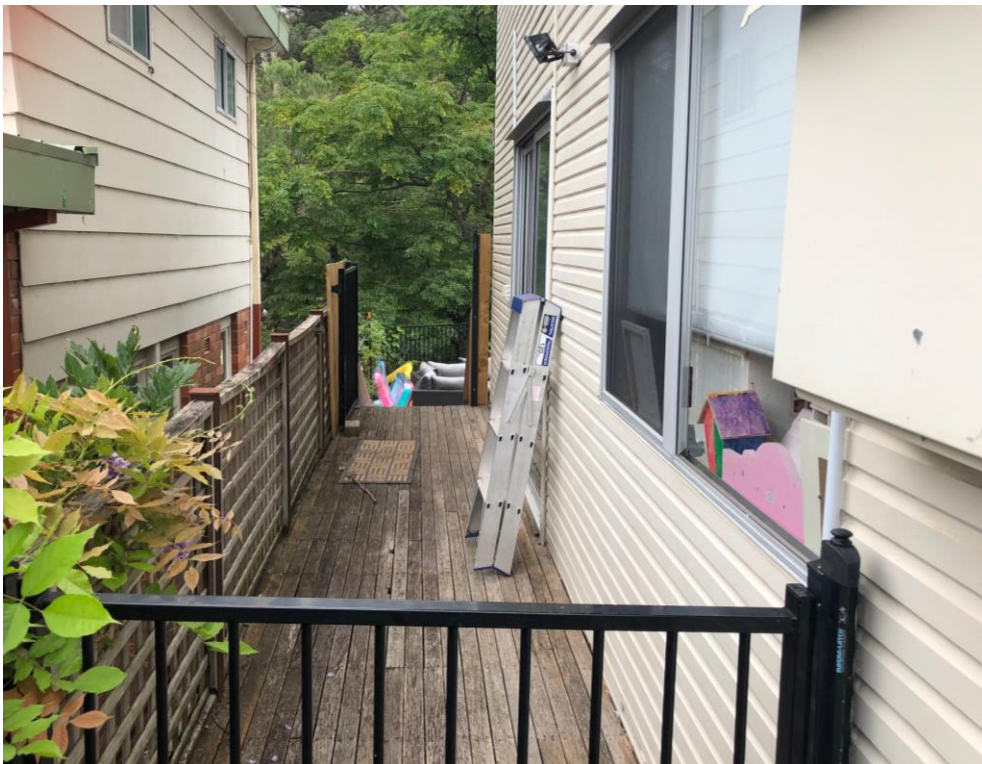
The existing dwelling, view from Owen Stanley Avenue
